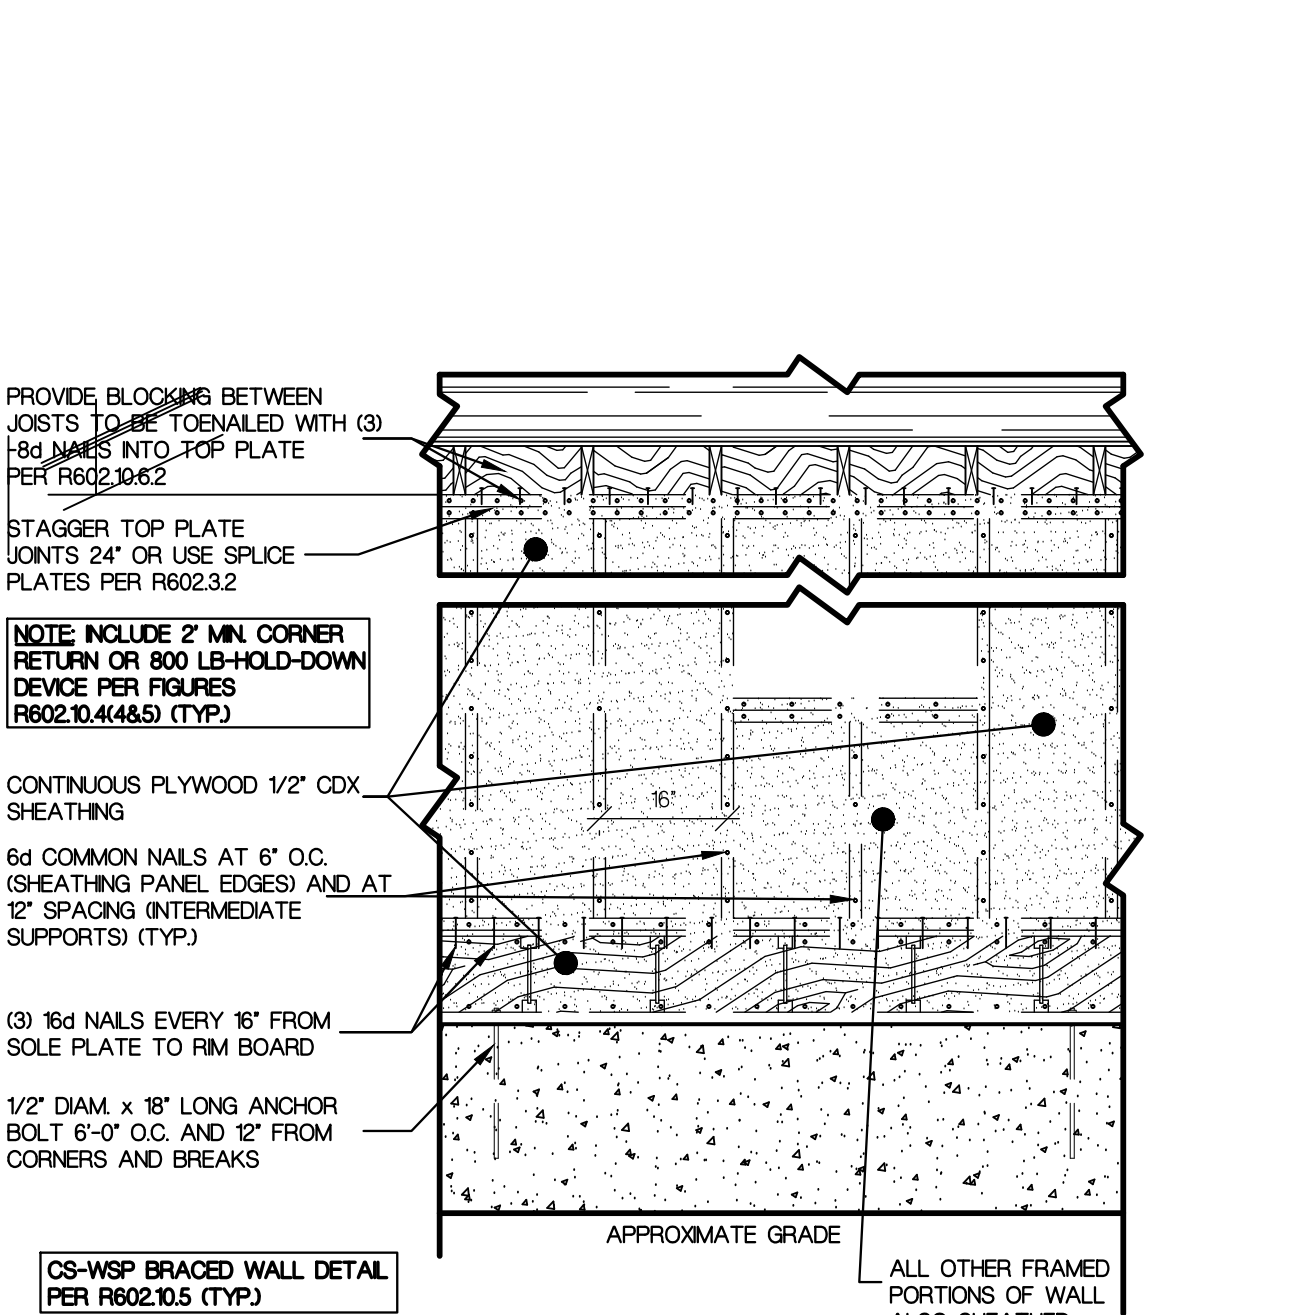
CONTINUOUS SHEATHING BRACED WALL
